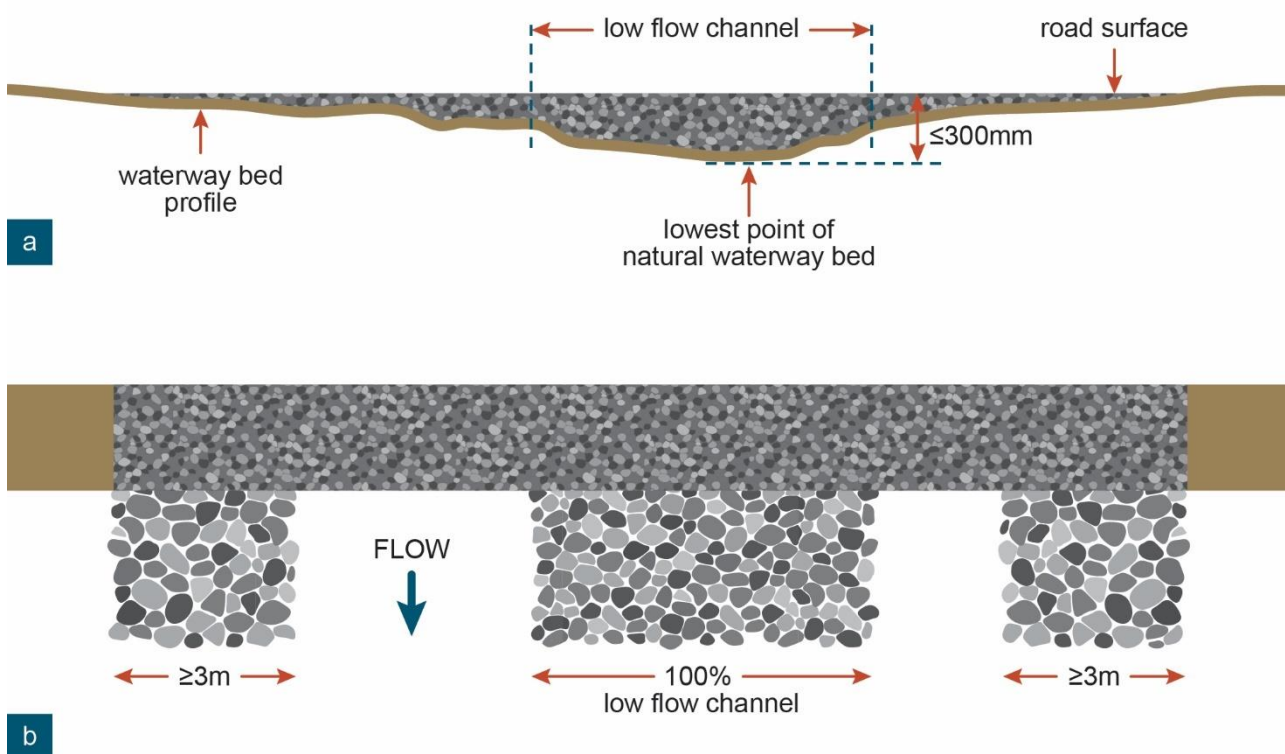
Low level crossing option 2 – purple and red waterways (a) cross-section of waterway (b) plan view
